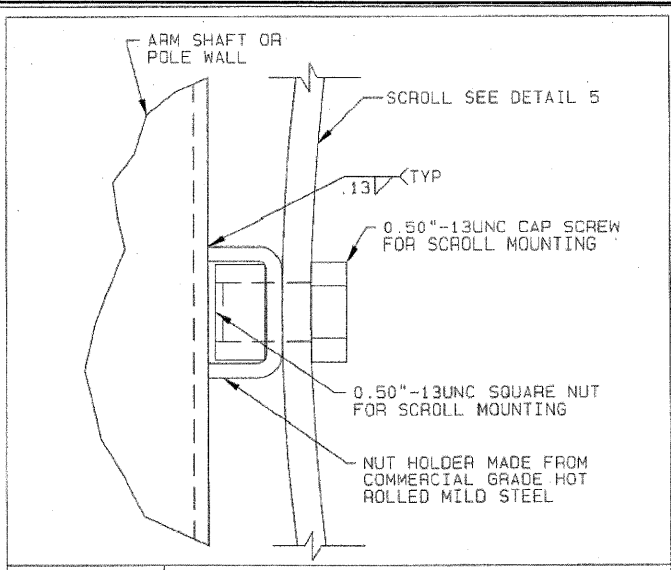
LUMINAIRE ARM ATTACHMENT
